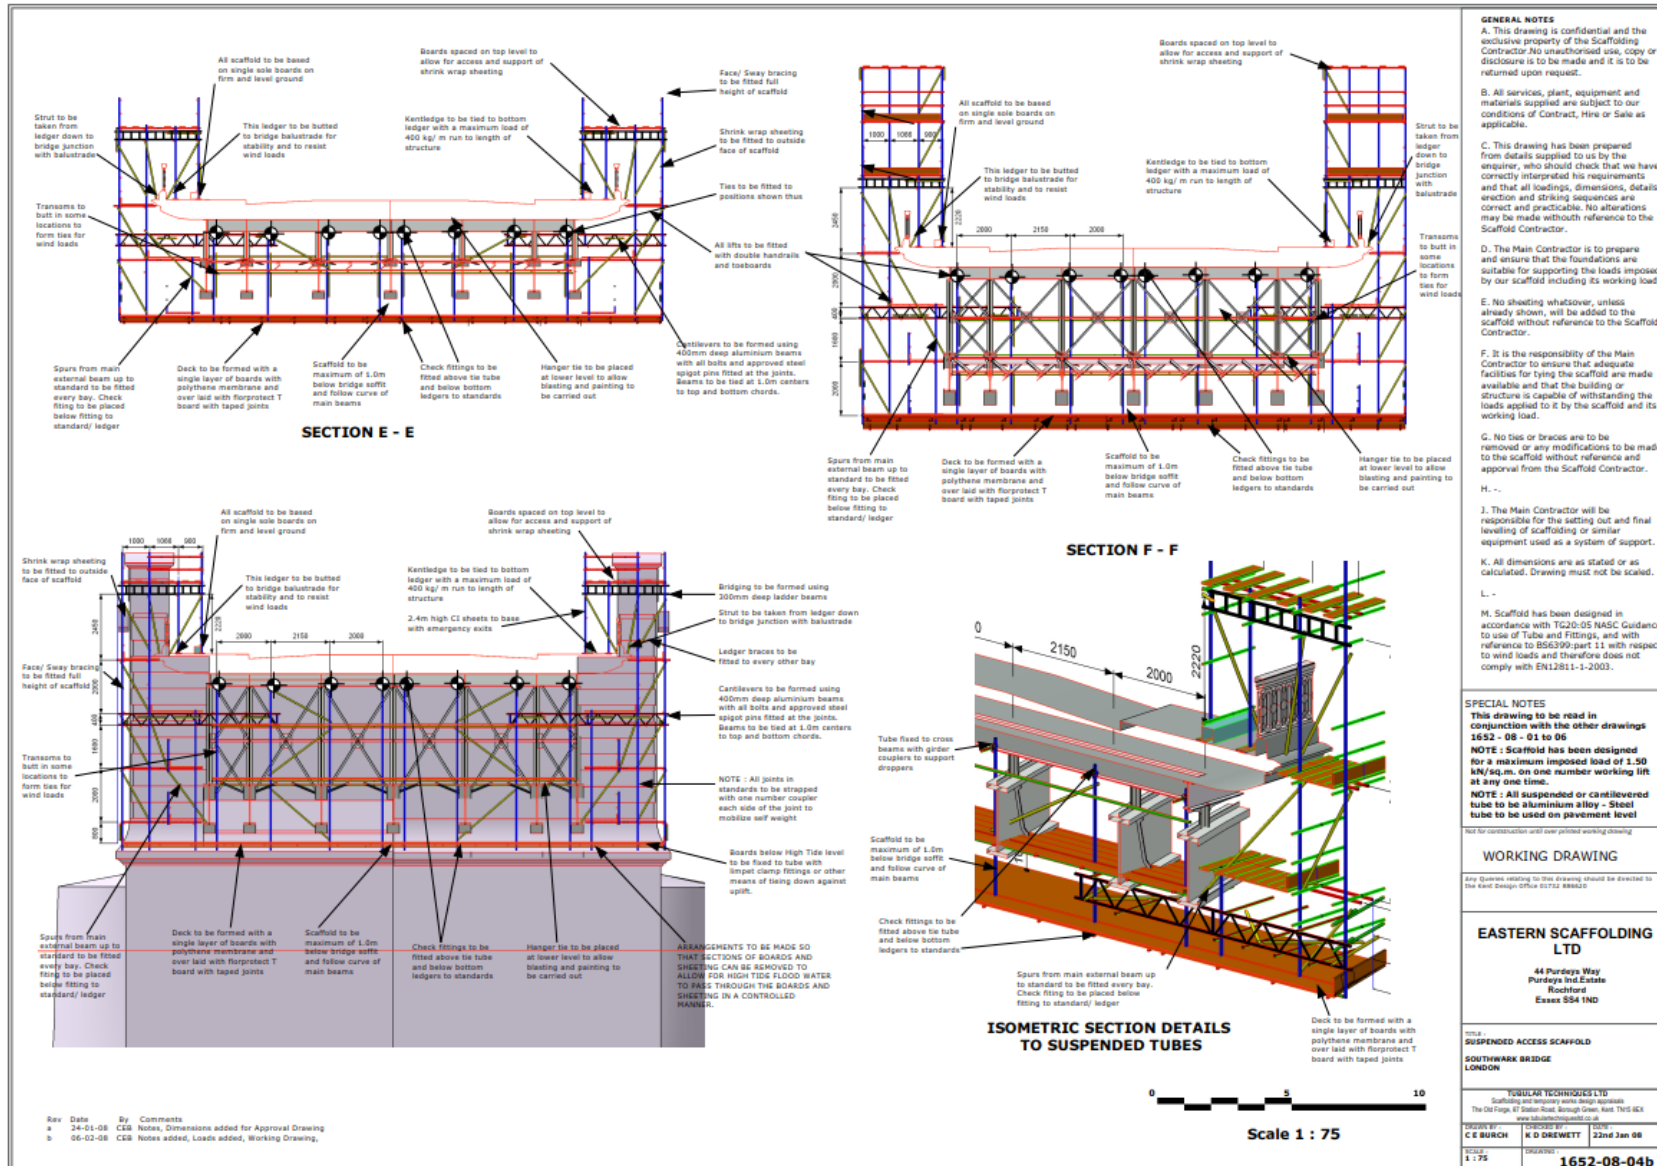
Scaffolding used on Southwark Bridge [4/6]
